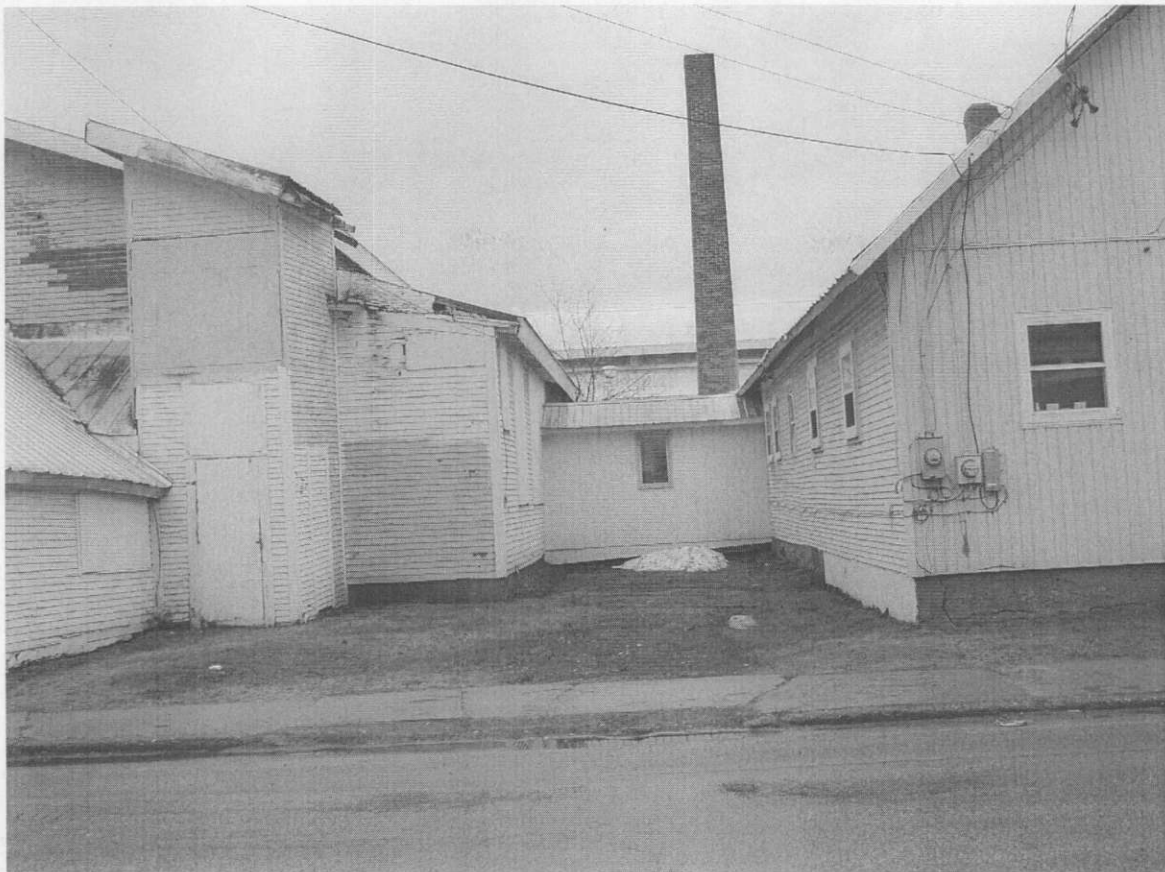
View S showing west elevation of the Old Office and Granite Shed, the Dust Collector and north and east elevations of the Large Office/ former granite manufacturing supply store and non-historic connector. Note historic battered chimney associated with the boiler for the granite industry. The pellet storage silo will be located in the vicinity of the connector when it is removed.
